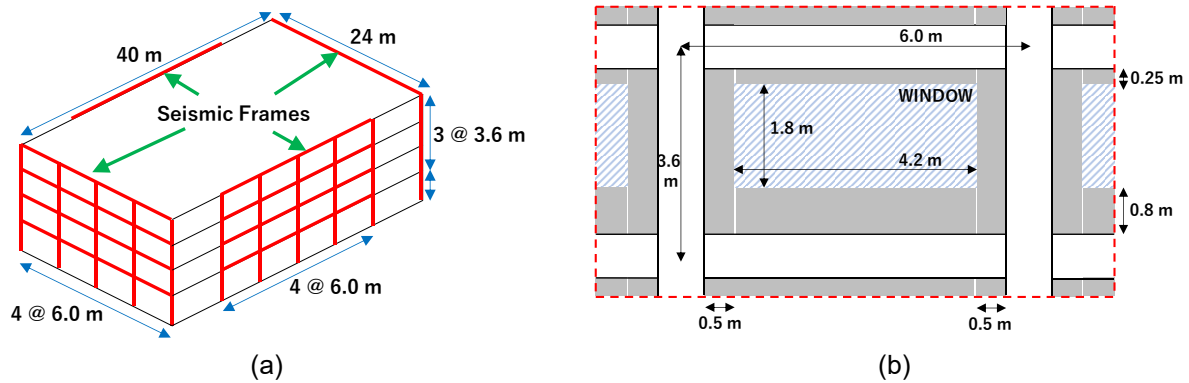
Case study building details; (a) building layout, and (b) cladding layout
